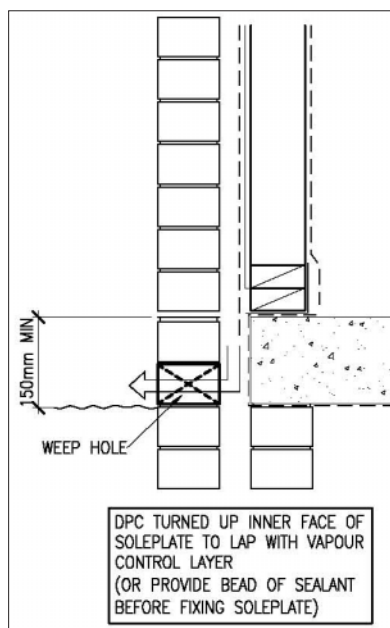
Ground floor soleplate detail (Courtesy NHBC Standards Section 6.2, April 2002)
